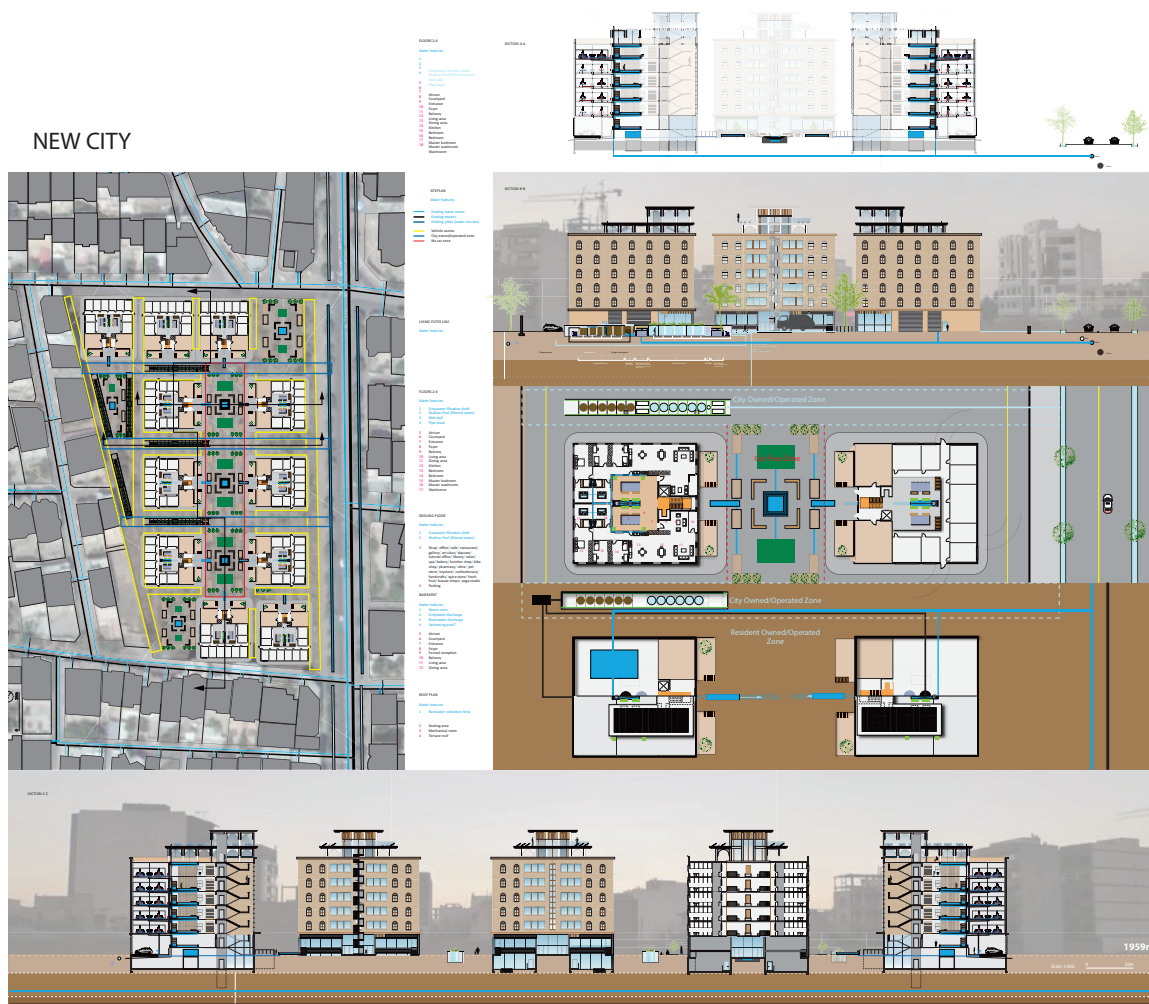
Plan and section of newly proposed buildings and treatment lines in city fabric with attention to water recycling as well as the greenery and pools that create social spaces.
